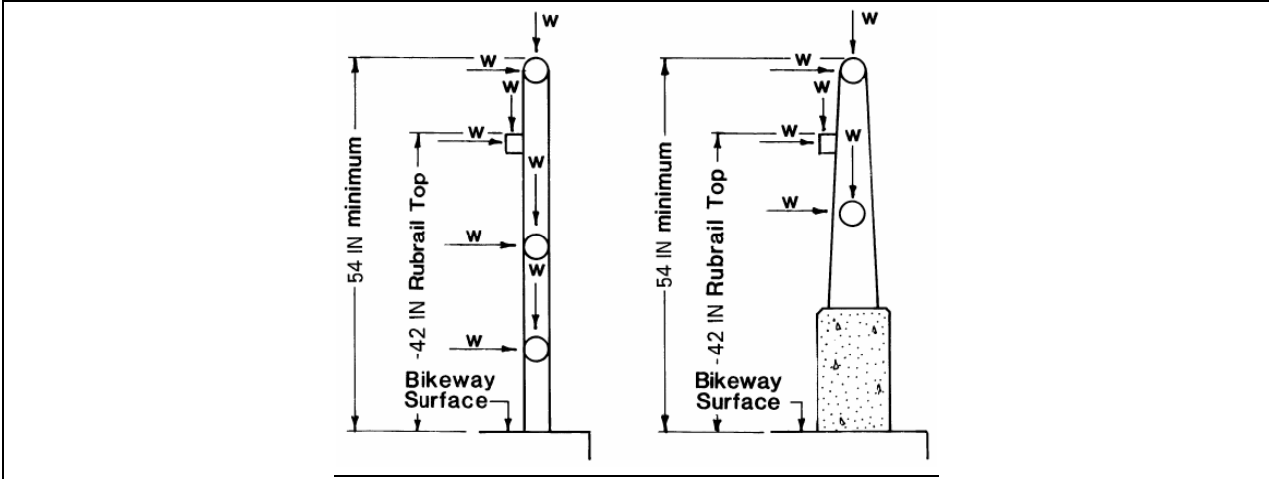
Bicycle Railing Loads—To be used on the outer edge of a bikeway when highway traffic is separated from bicycle traffic by a traffic railing. Railing shape illustrative only.
